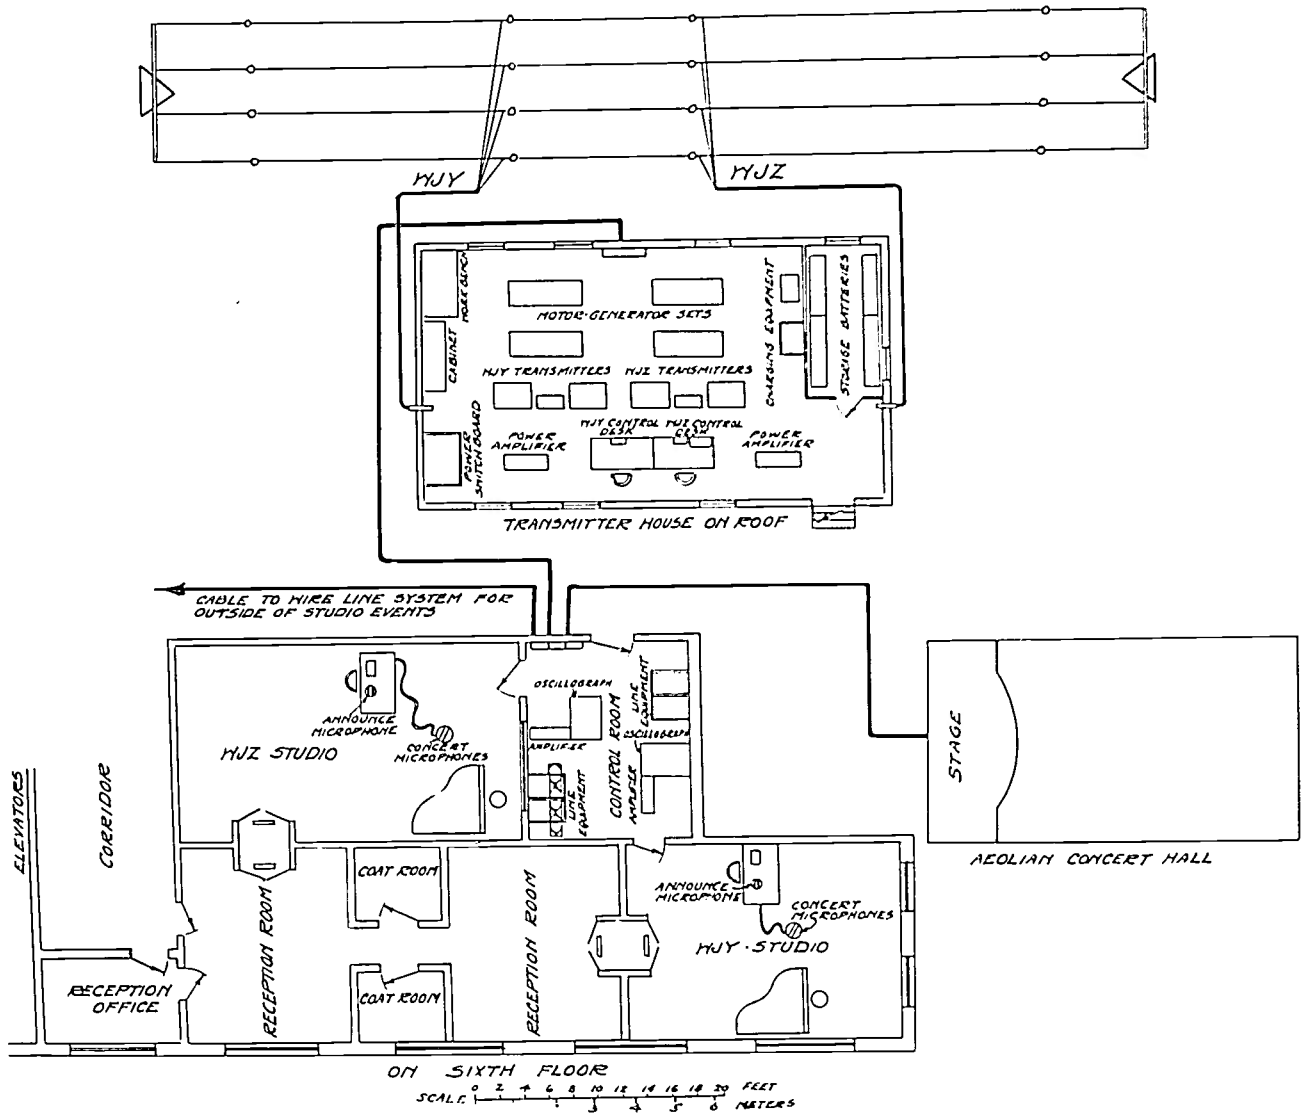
Broadcast Central: General Arrangement, in Aeolian Building
